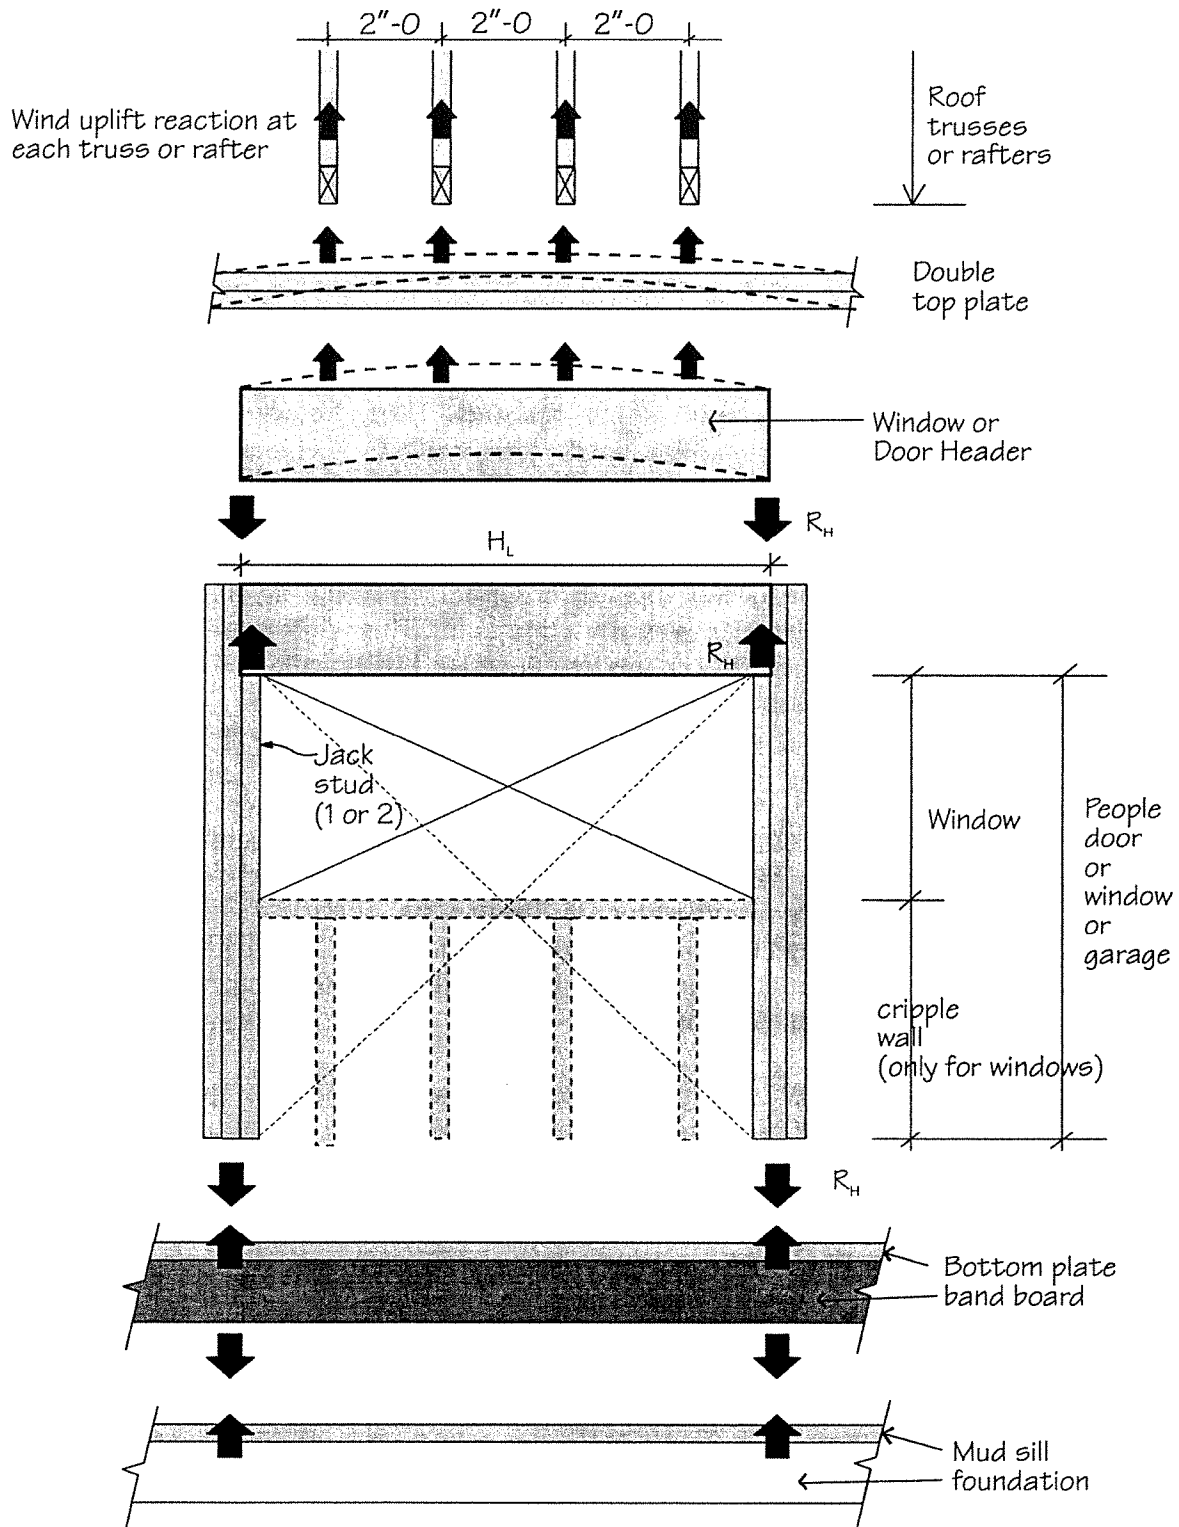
Exploded View of Uplift at Opening in Exterior Wall
